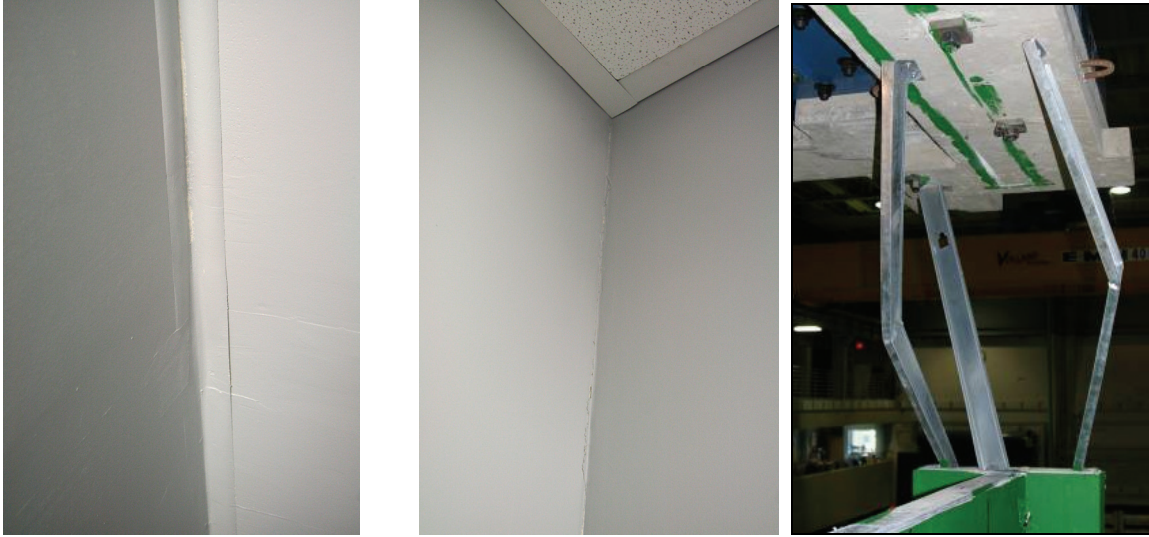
Examples of damage stage 1 (left, center: Tests by R. Retamales et al. 2007, photos by E. Miranda, right: NEES Nonstructural Test).
